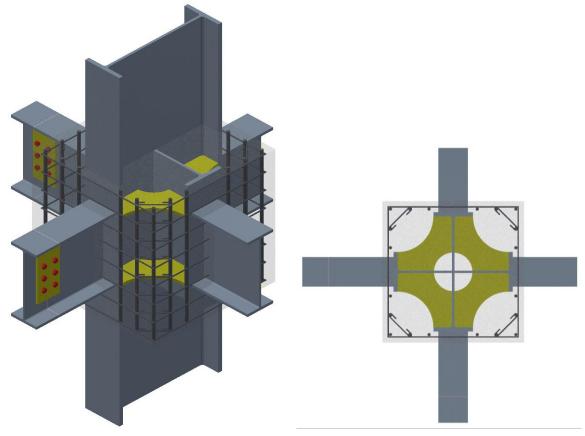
Moment connection between steel beam and concrete encased steel column
